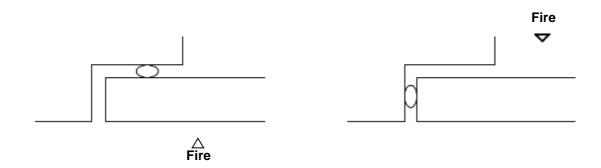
Non intumescent seals between frame and door leaf/leaves, (fitted in leaf or frame) - Additional test with added seal
